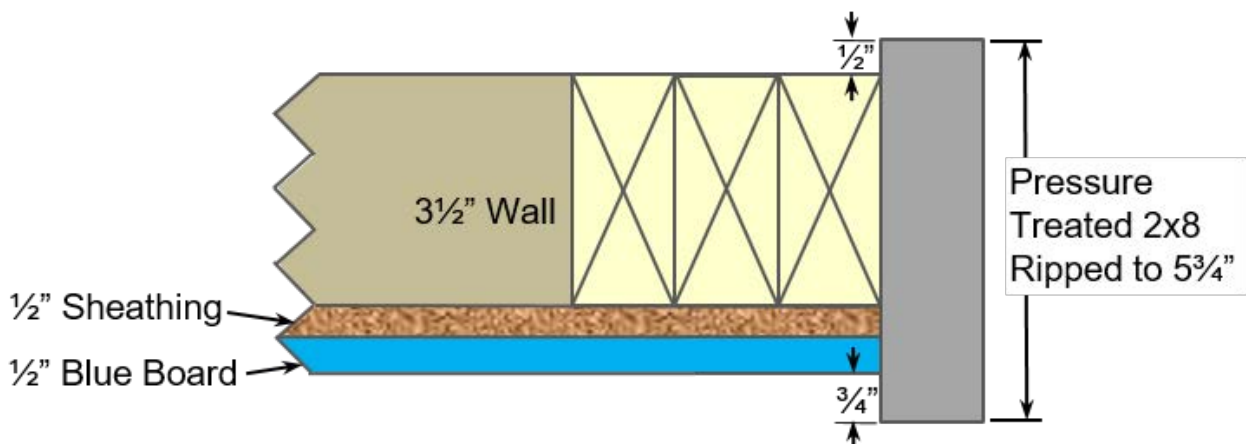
Placement of Ripped 2x8 for Garage Opening on Siding Wall
